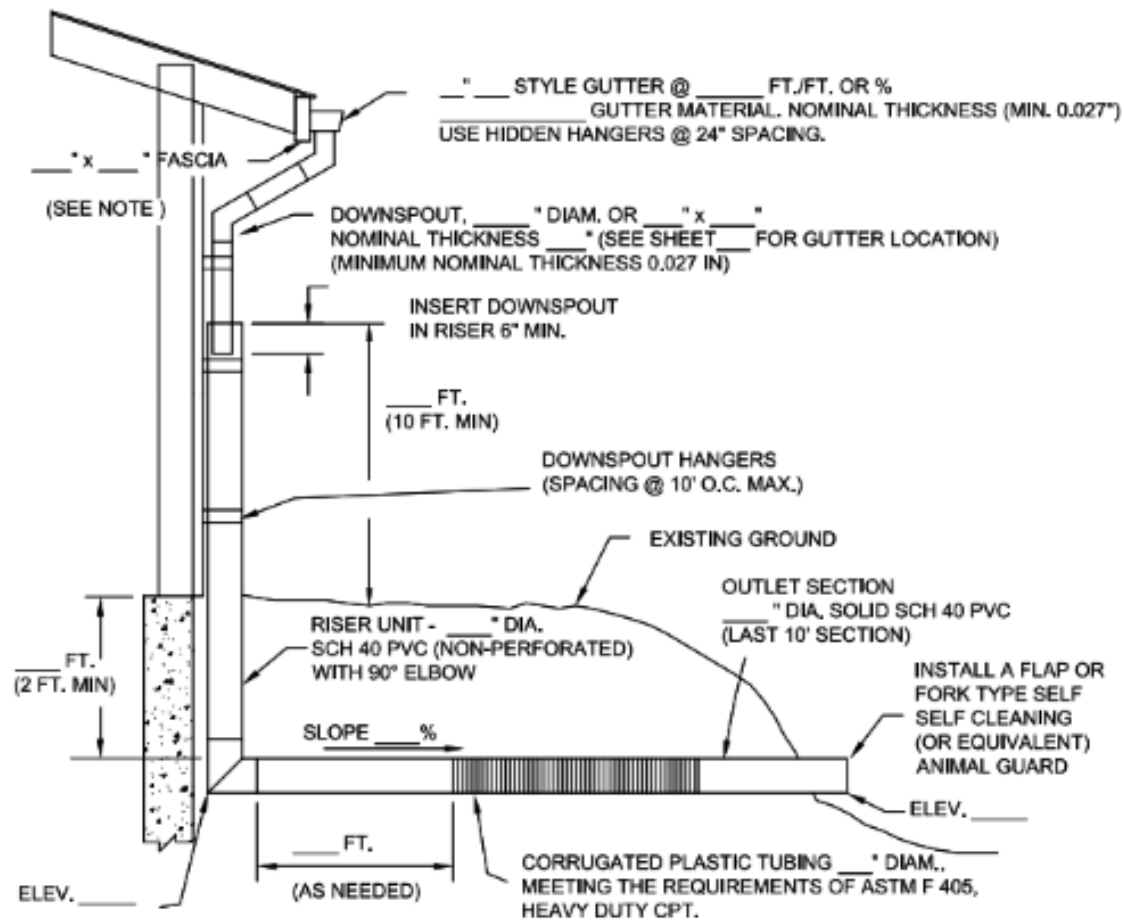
Roof runoff structure shows the connection between a roof gutter, downspout, and underground outlet with example sizing dimensions and materials (NRCS CPS 558 Training).
